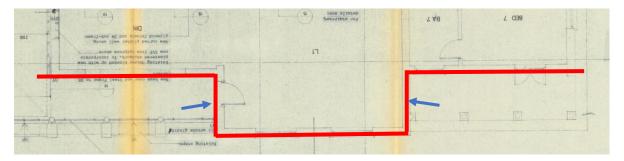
Extract from 1989 ground floor plan illustrating the Council's position.
